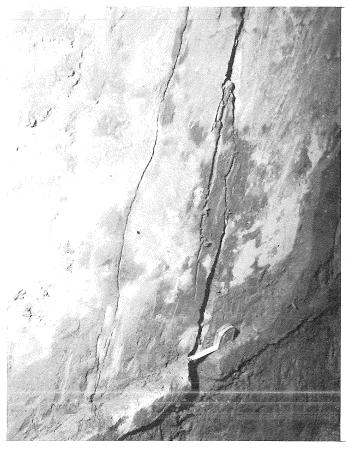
Bottom of break in north wall of drainage inspection chamber of Station 0+89.
